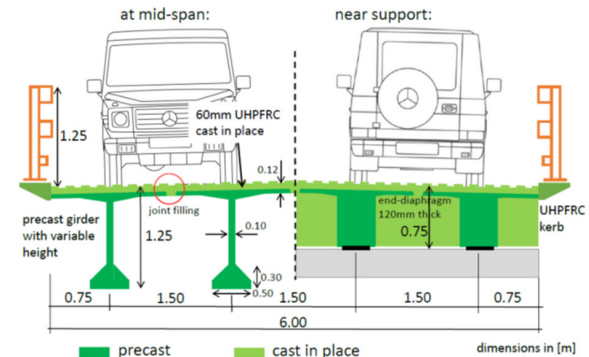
R-UHPFRC road bridge: cross-sections at mid-span and support.
